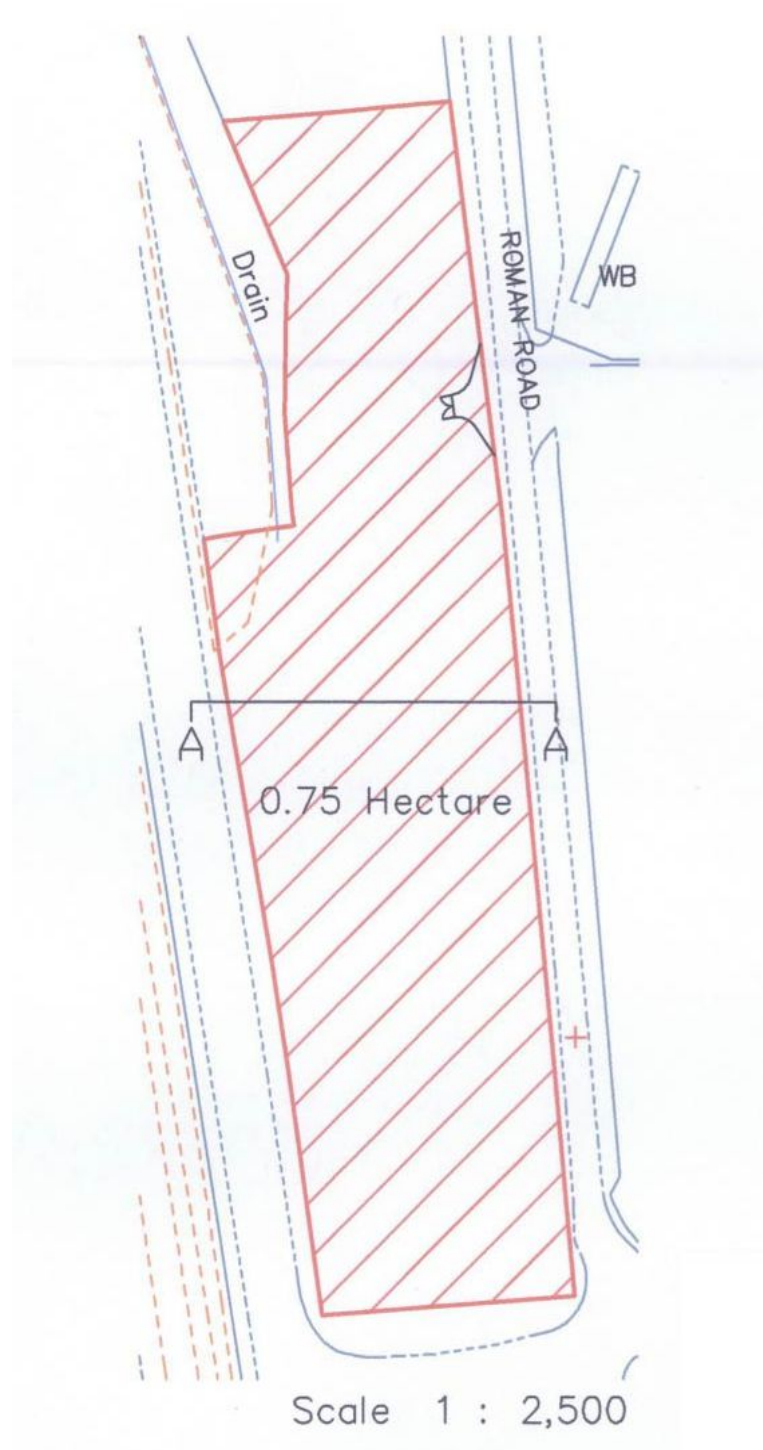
proposed site plan (c) Plan B Building Architectural Consultant
